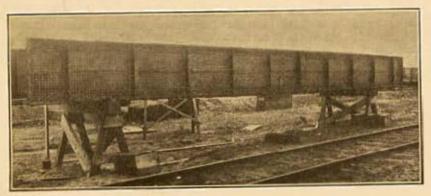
LEASIDE GIRDERS AFTER APPLICATION OF GUNITE
